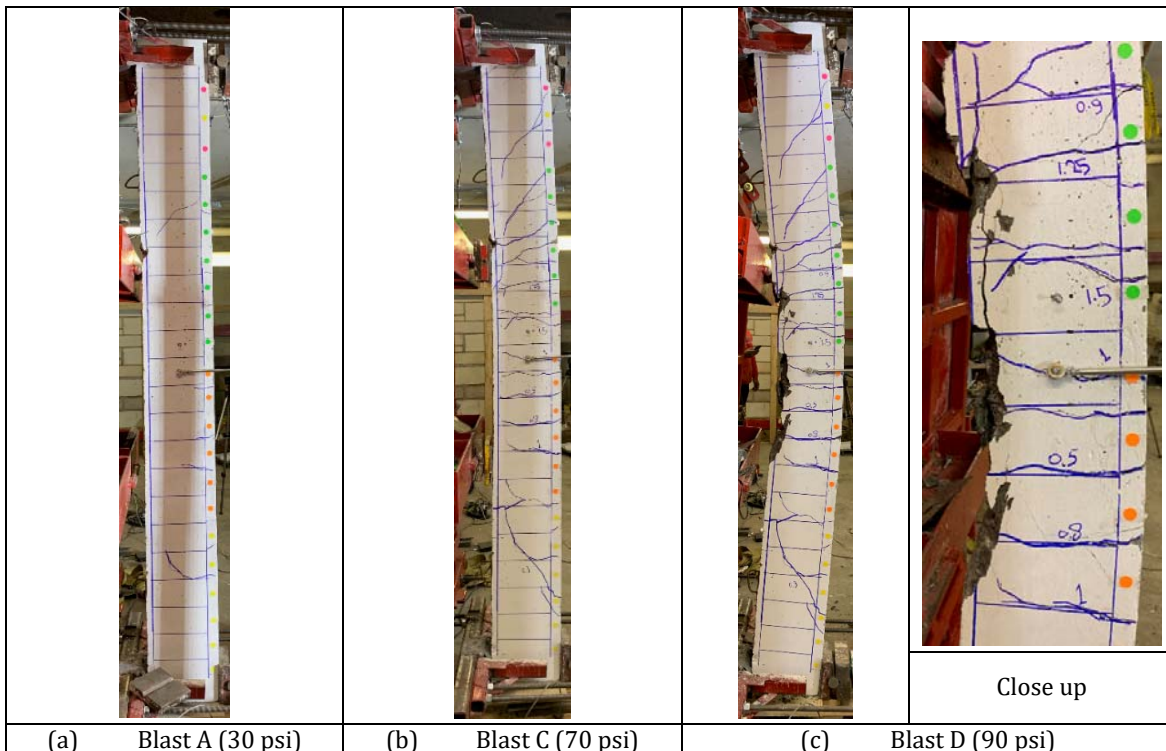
Failure of the specimen at Blast A, C, and D
